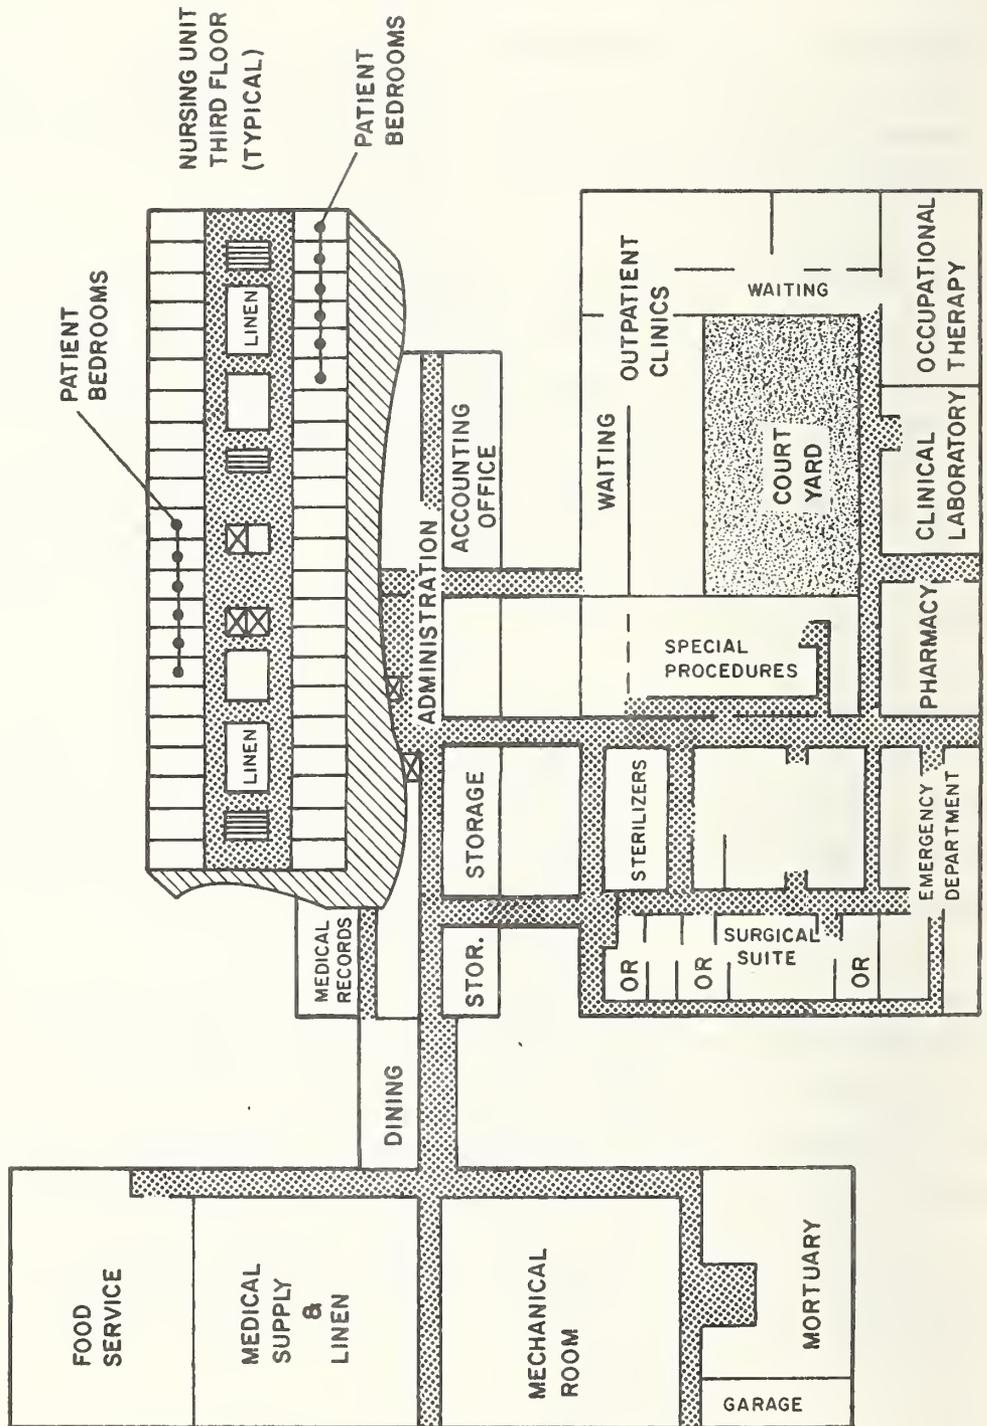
FLOOR PLAN: THE BEAUNE HOSPITAL
